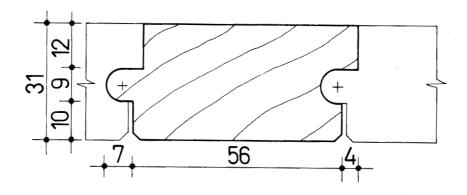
75 mm x 40 mm TONGUE AND GROOVE SECRET NAIL FLOORING (full size)
